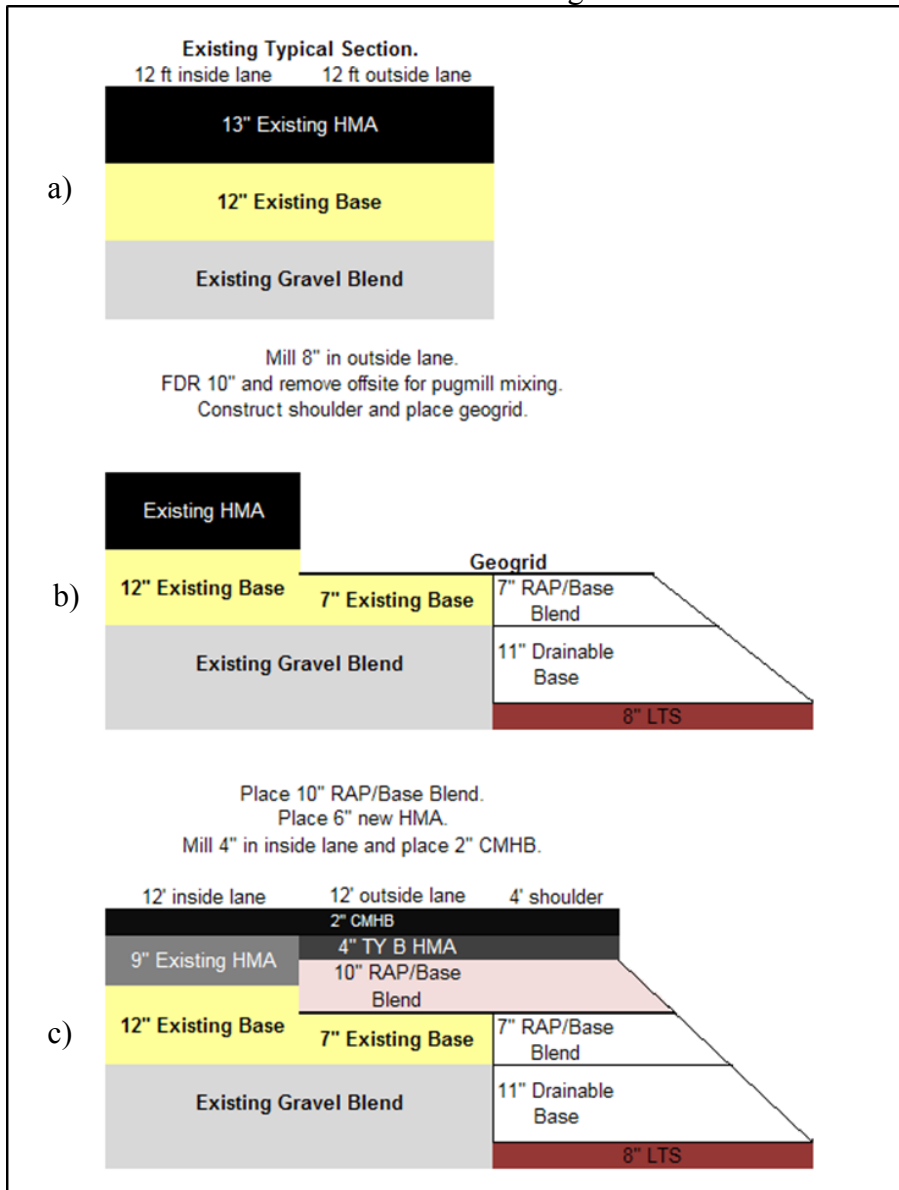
Recommendation for majority of evaluated area of SH-21 (Texas Department of Transportation, 2010): a) Pre-existing pavement structure, b) Suggested milling of asphalt and addition of Shoulder, and c) New recommended pavement structure
